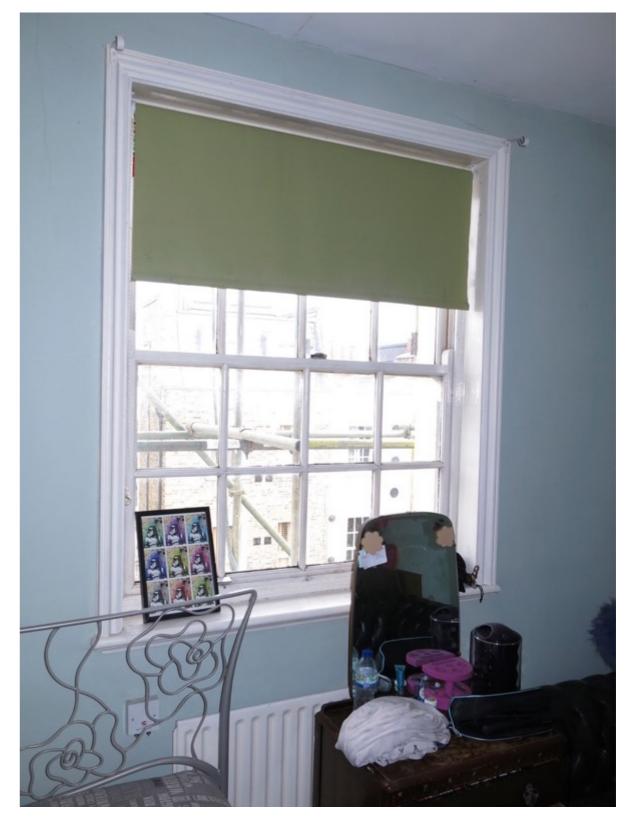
Existing sash window in the second bedroom facing onto Drummond Street
